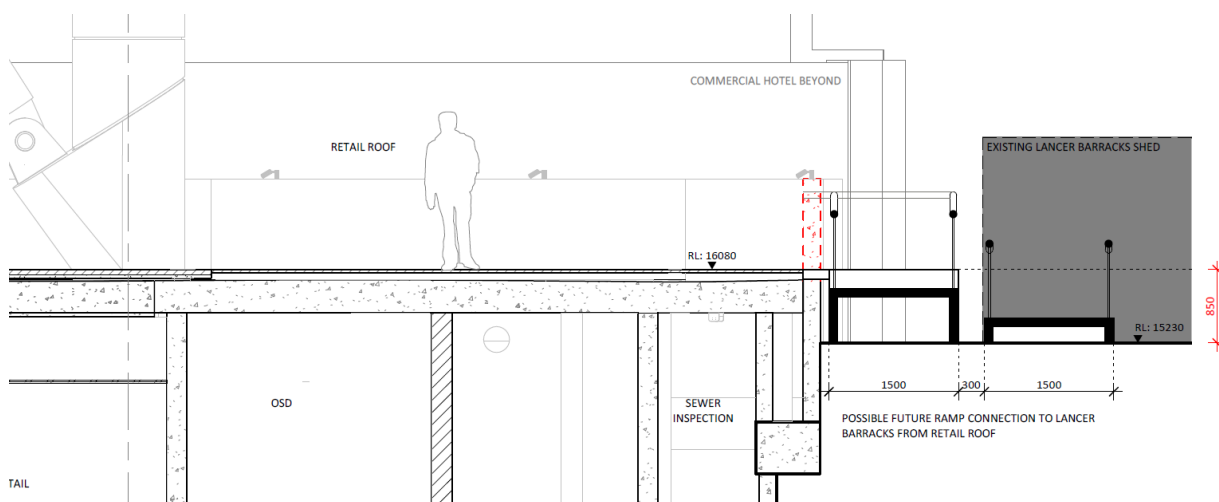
Proposed Section showing potential future connection to Lancer Barracks
